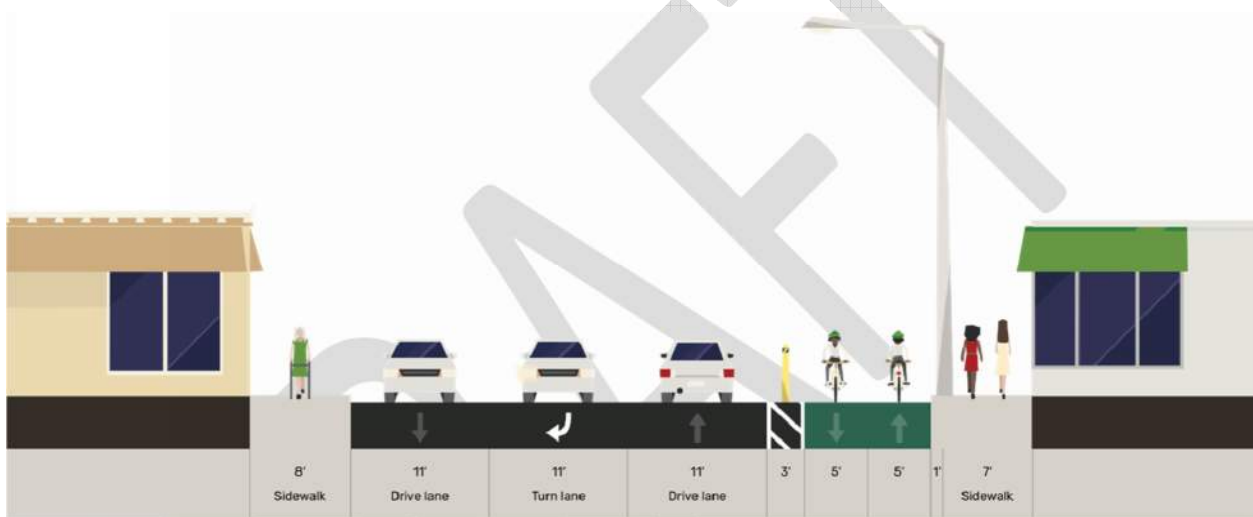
Beach Street (Eastbound) East of Industrial Rd to Walker Street
